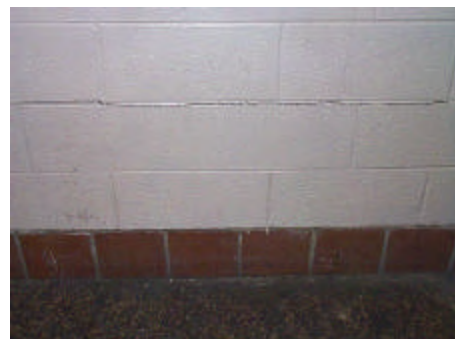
Main Ice Rink – Eastern Wall – Crack in masonry wall.
